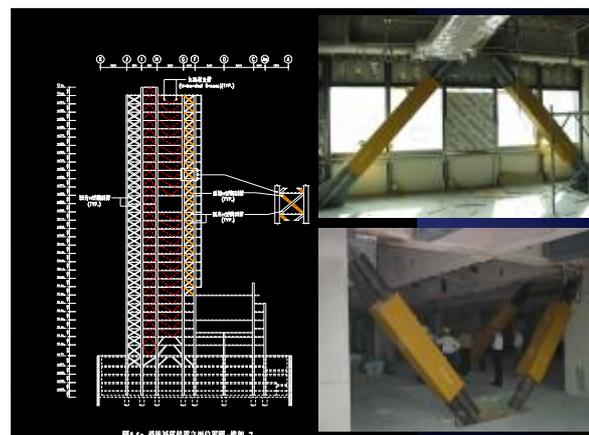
(c) Elevation View of one frame in Taipei County Hall
